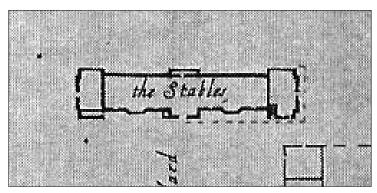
Henry Winstanley. The plan of the stable building, a detail from the General Ground Plot, c.1676.
